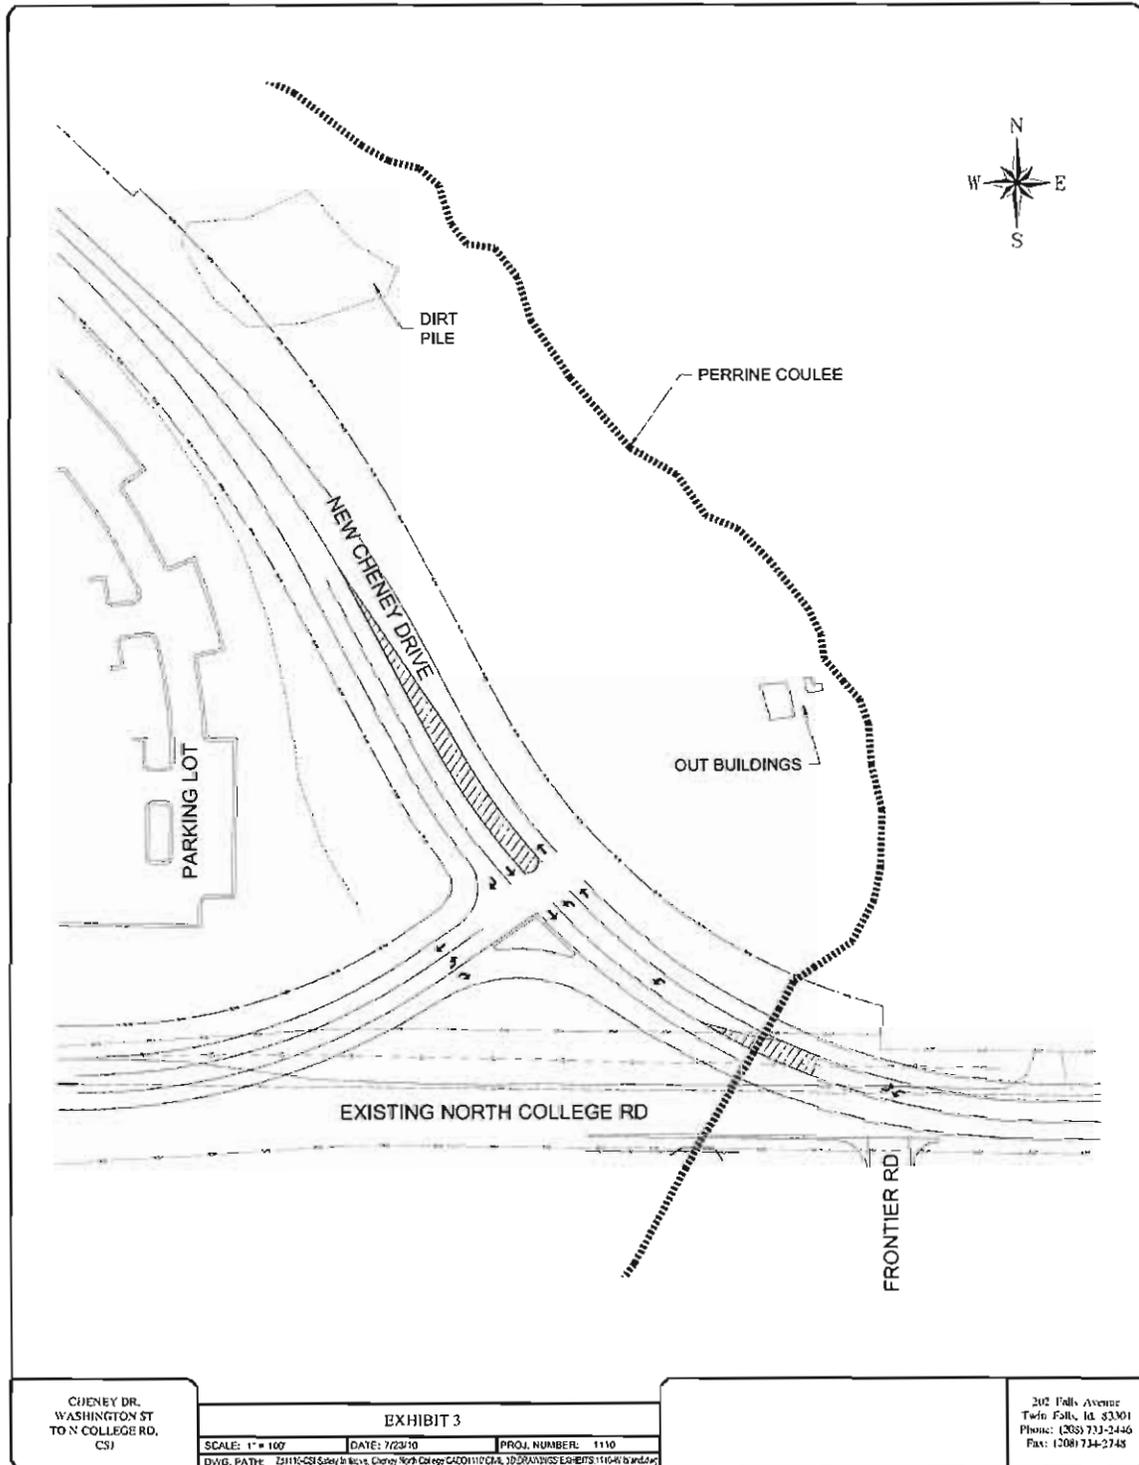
Proposed Layout of the North College Rd & Cheney Dr Intersection
